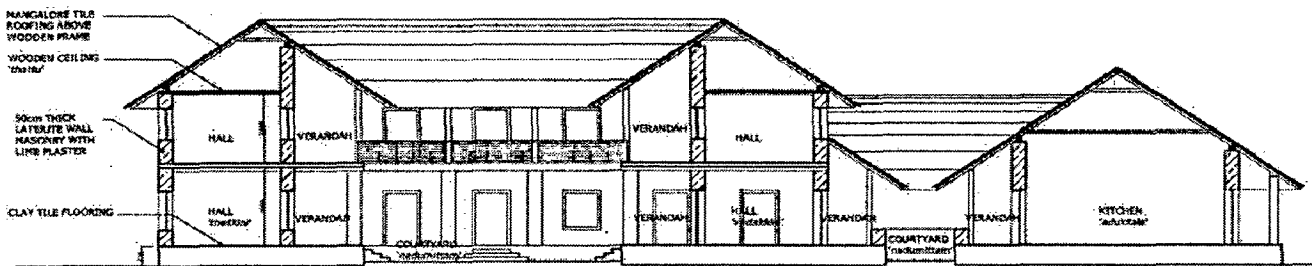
Longitudinal section of double storeyed courtyard house with two courtyards
